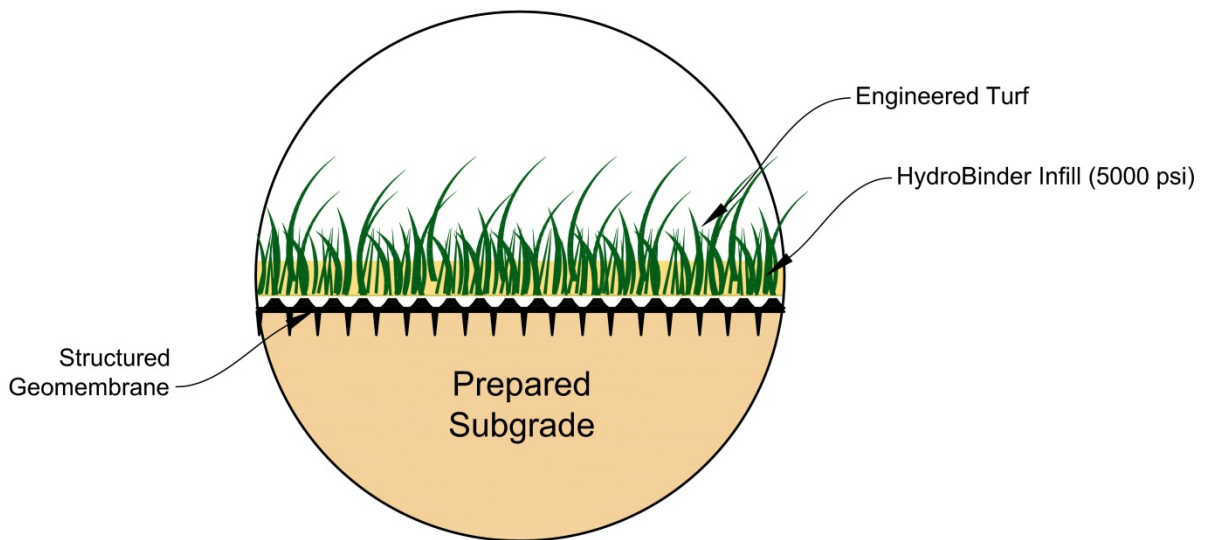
Section of HydroTurf® CS with Structured Geomembrane
